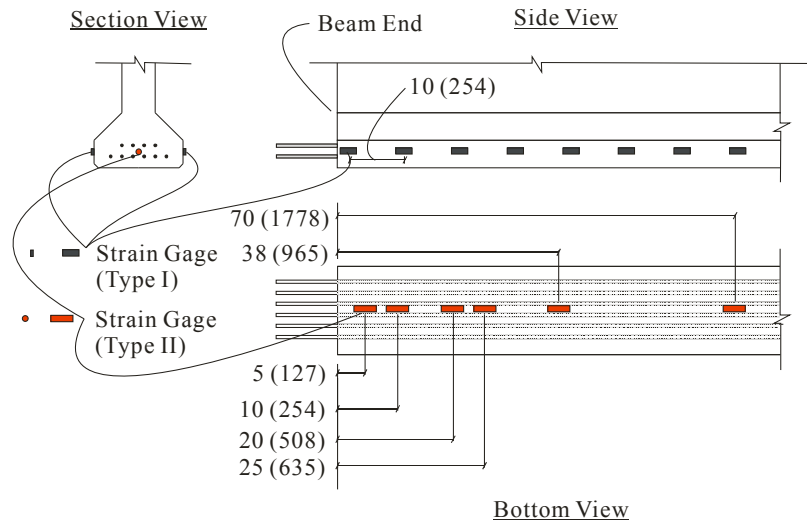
Diagram of Concrete Surface Strain Gage Layout (Type I) and Embedded Concrete Strain Gage Layout (Type II).
